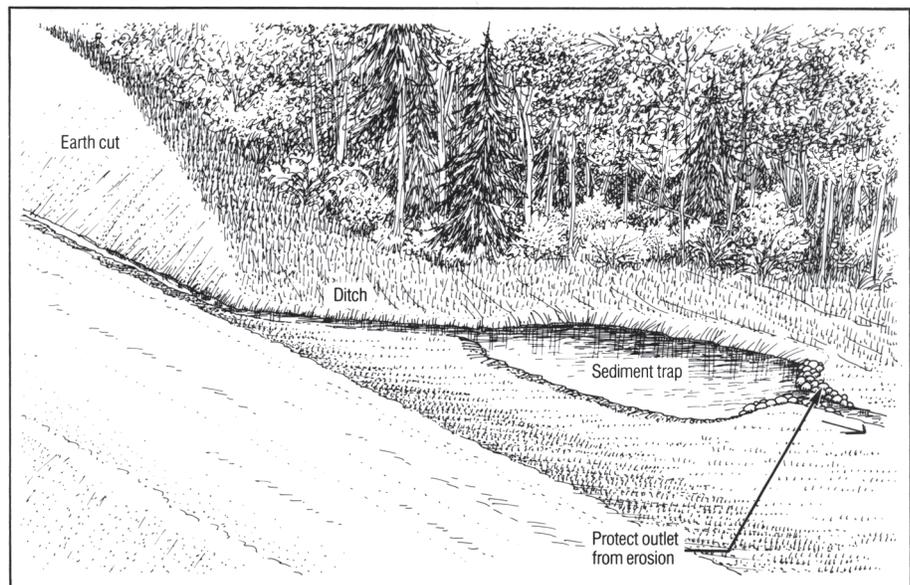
Sediment trap constructed to collect runoff from ditch along cutslope (Ontario MNR, 1990).
